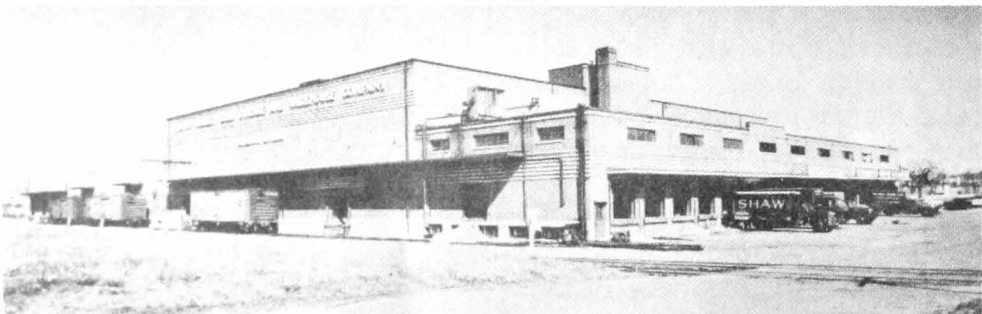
A modified one-story warehouse. Note the different heights of the buildings and the rail and truck unloading facilities. (Photo courtesy of Quincy Market Cold Storage and Warehouse Co.)
